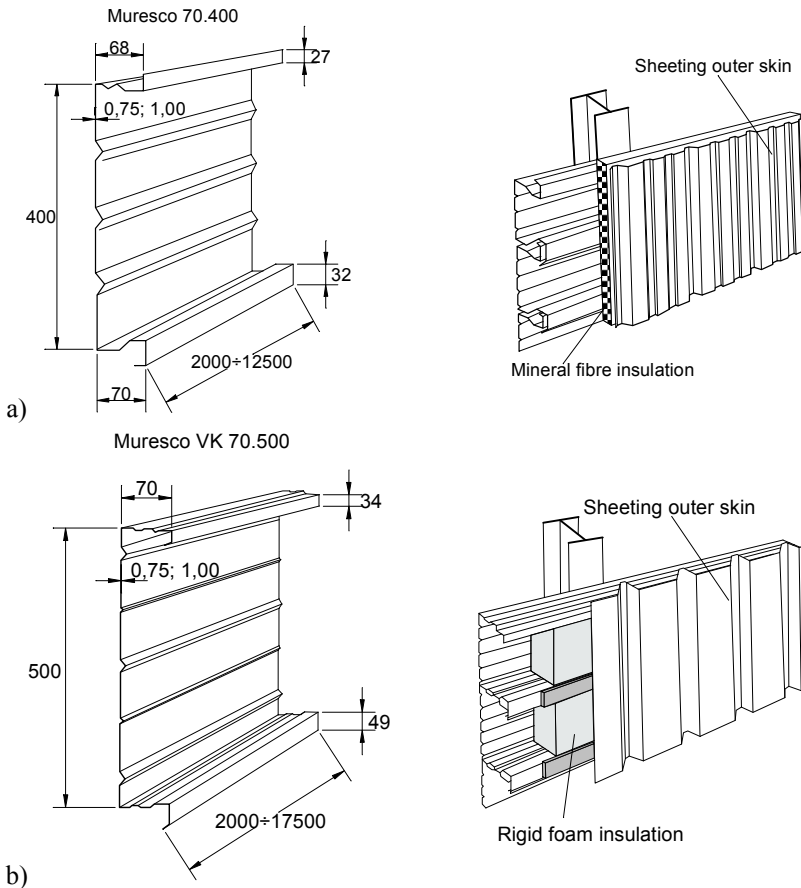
Two examples of using PAB liner trays in “Two layer built-up wall cladding construction”
